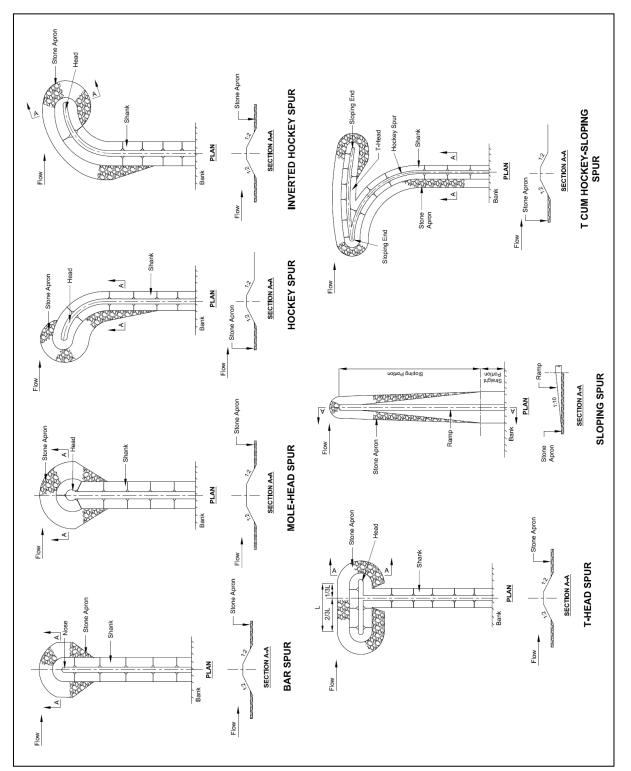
Typical Plan and Section of Different Spur Types [15]
